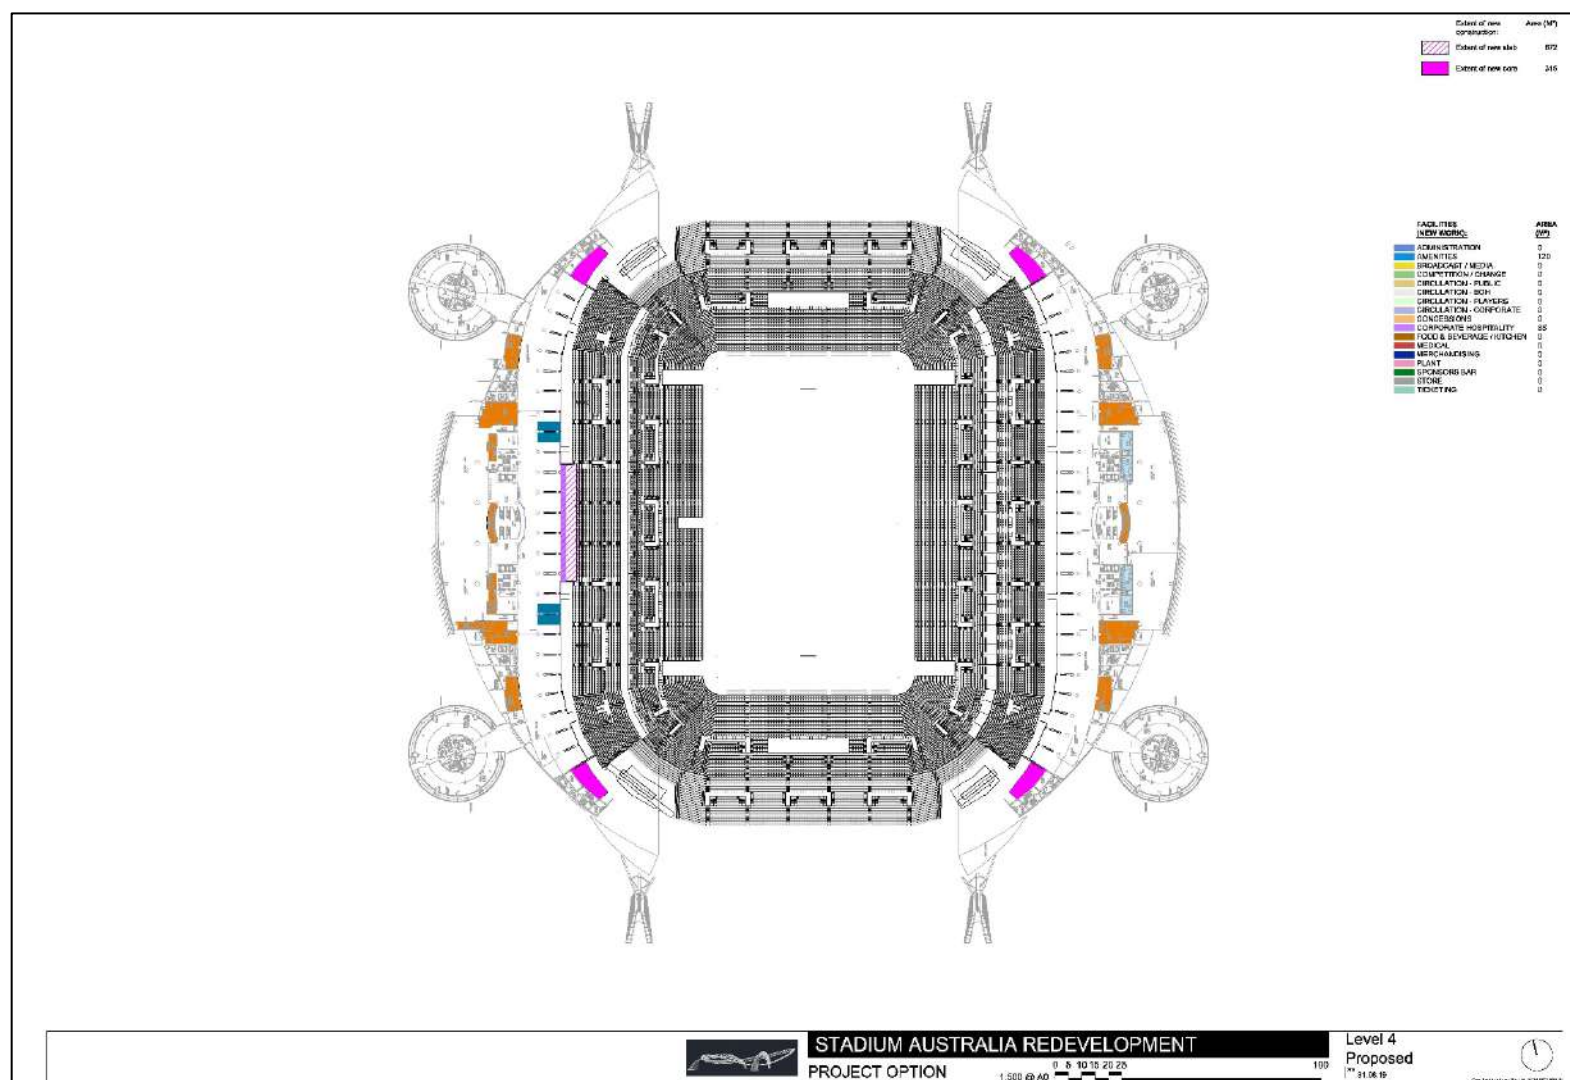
Proposed Level 4 Plan (Source: Cox, 2019)
